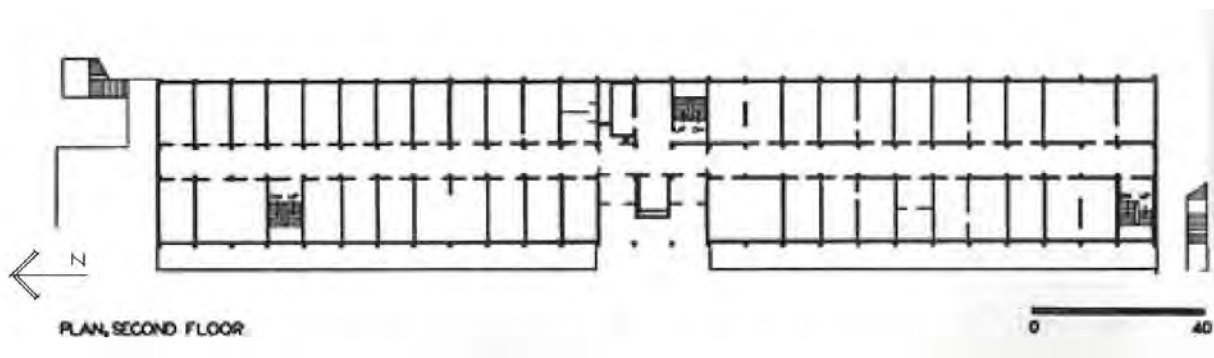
Second floor plan (Metz, 39). North is to left; the recessed entry in the west side is at bottom center.
